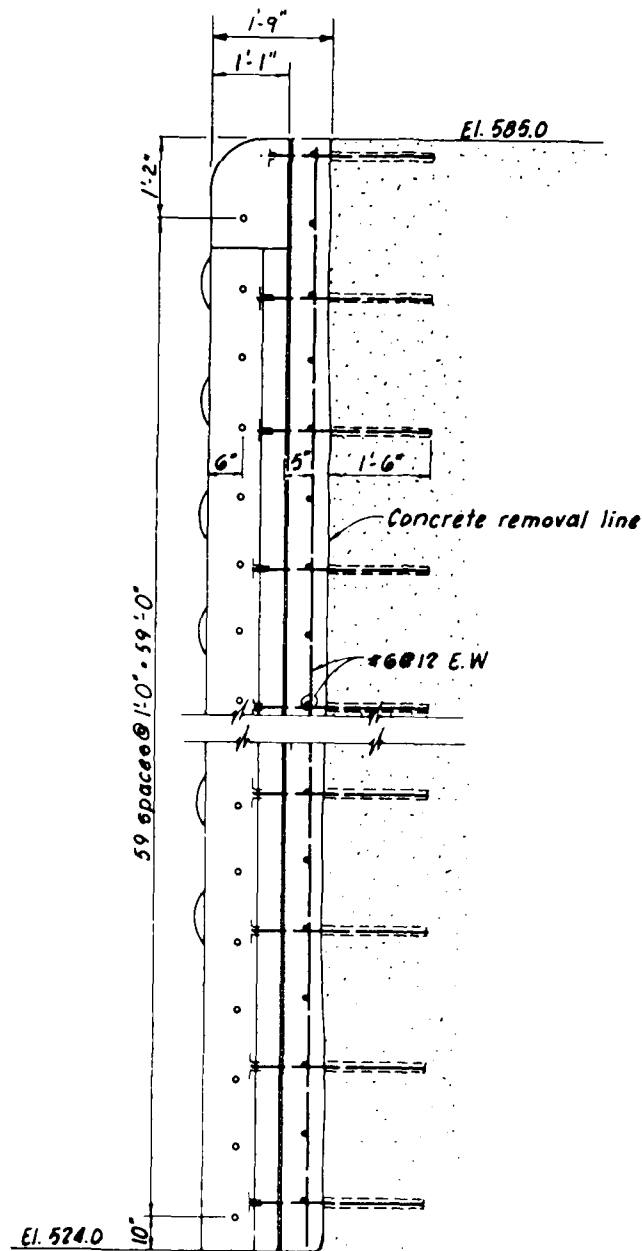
Ladder details of Sections A-A and C-C, Lockport Lock
